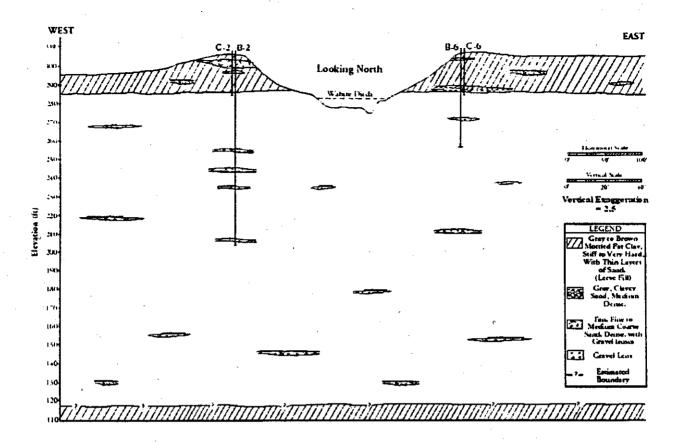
Cross-Section of Wahite Ditch Site Geology
